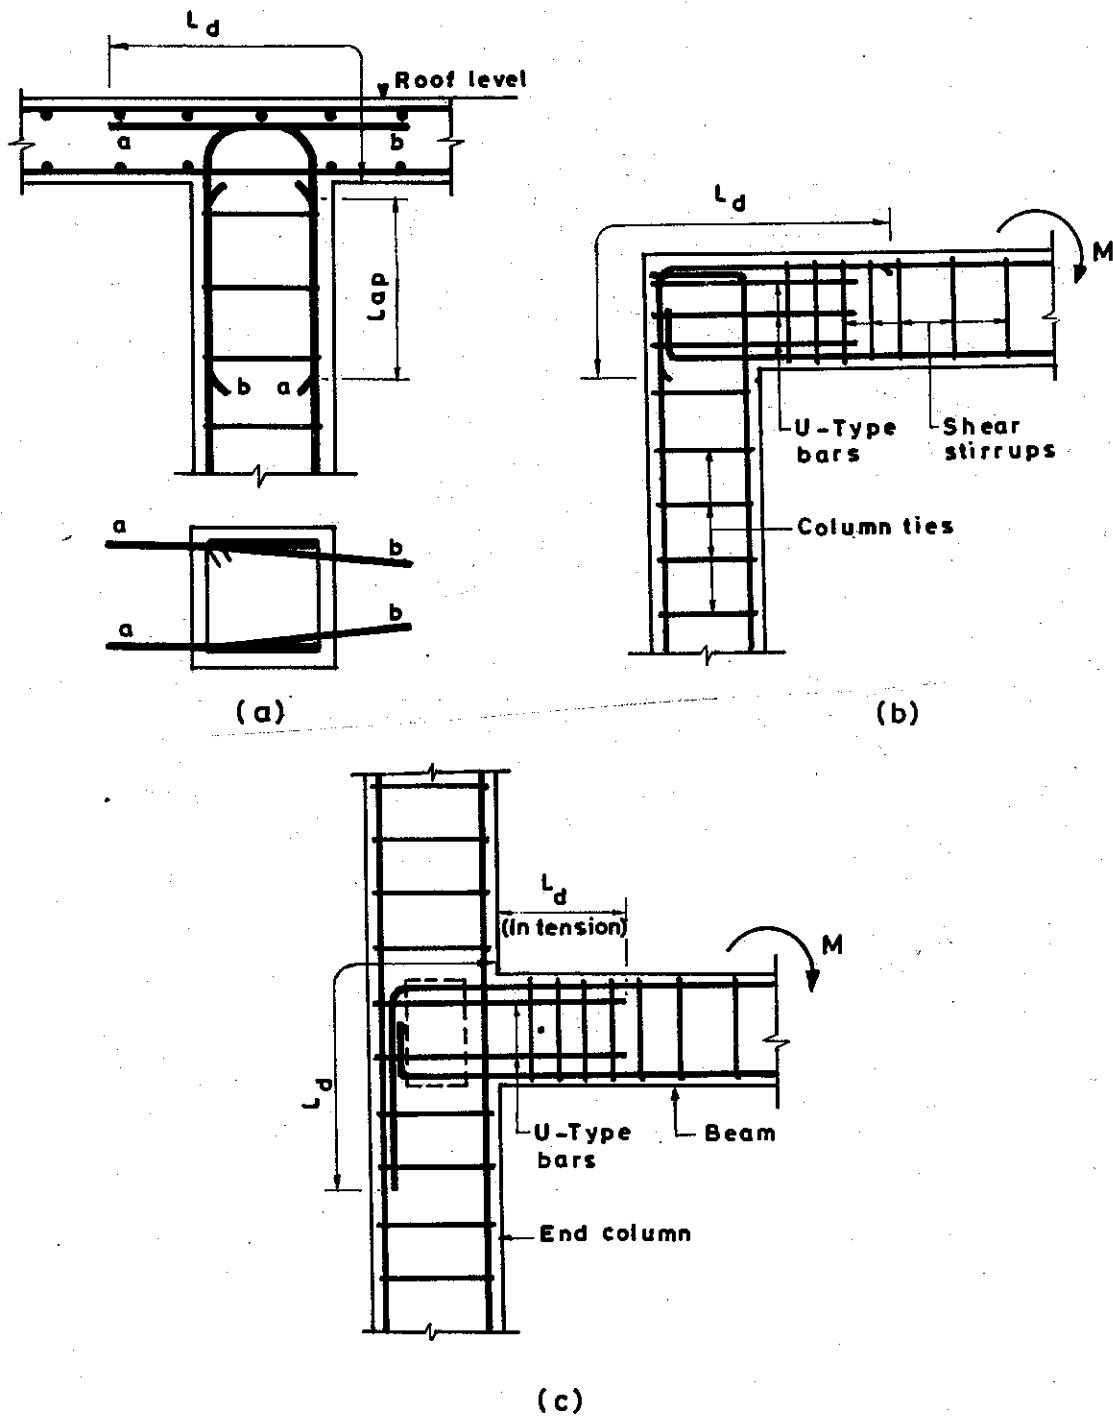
Details of reinforcement at column junctions: (a) Termination of column bars inside slab, (b) Fixed-end joint in a column, and (c) Typical detail of beam-column junction at external column.
